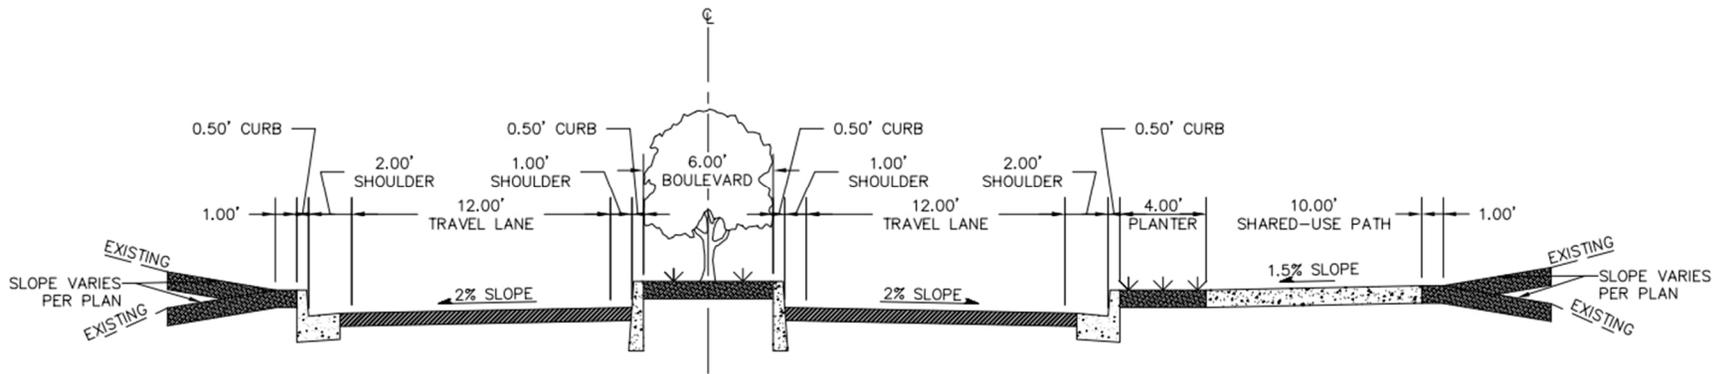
Alternative A, B, and E - Shared-Use Path Typical Road Section
